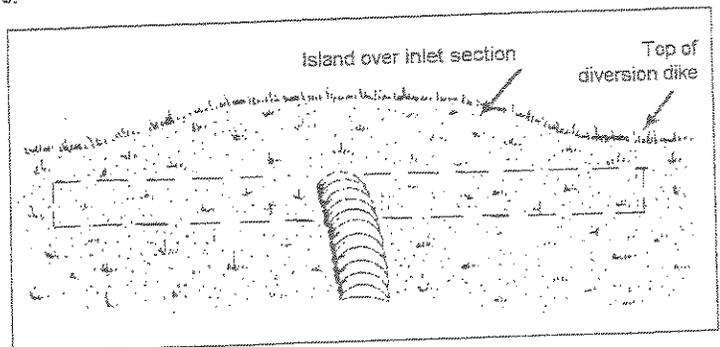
C. Slope drain should have a compacted fill island to prevent overtopping and diversion dike to direct runoff to the drain pipe.
